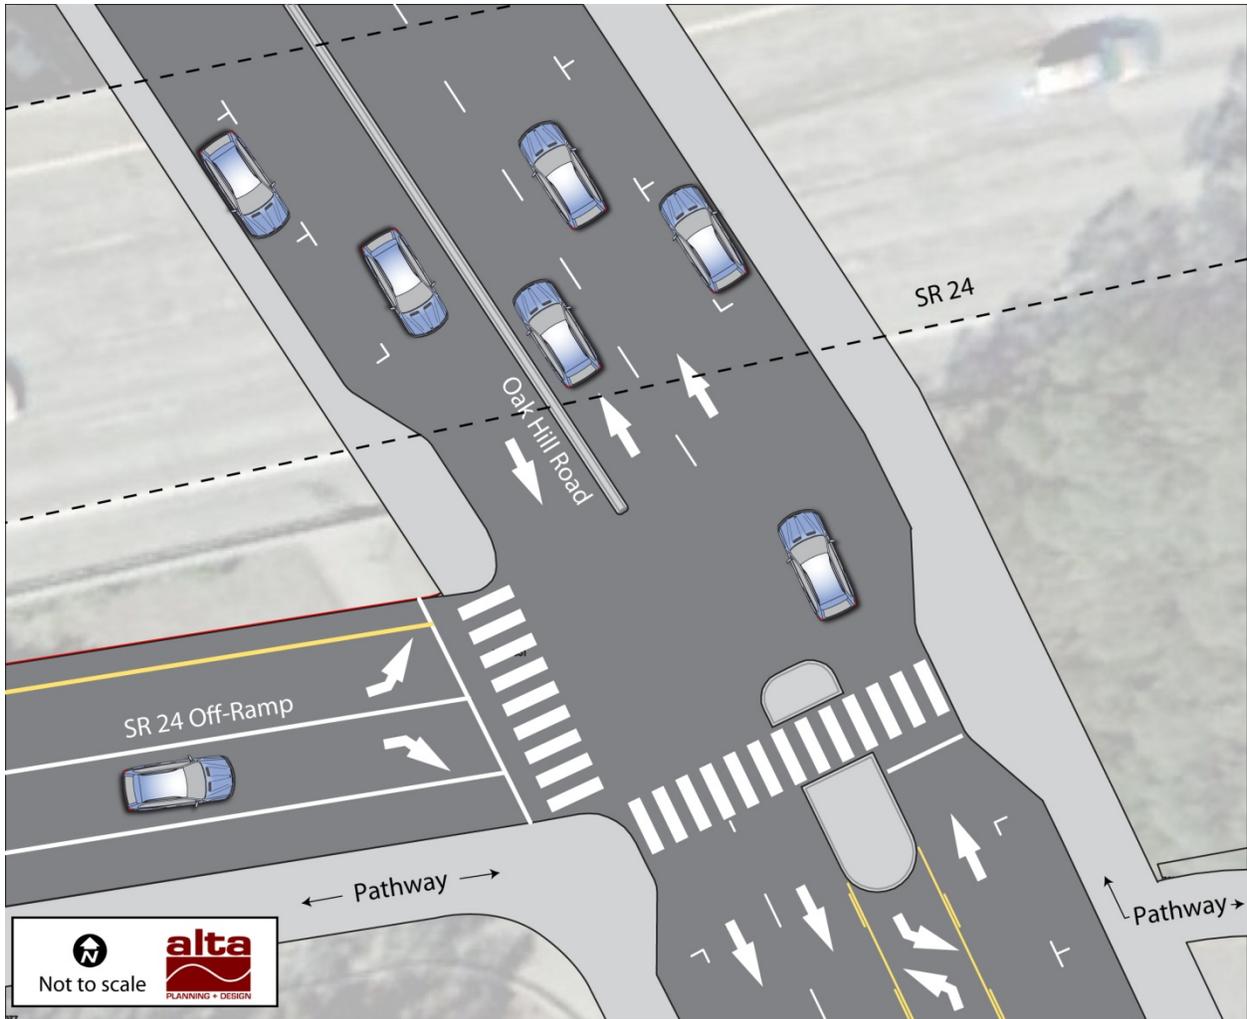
Plan View of Oak Hill Road at SR 24: Option 3
